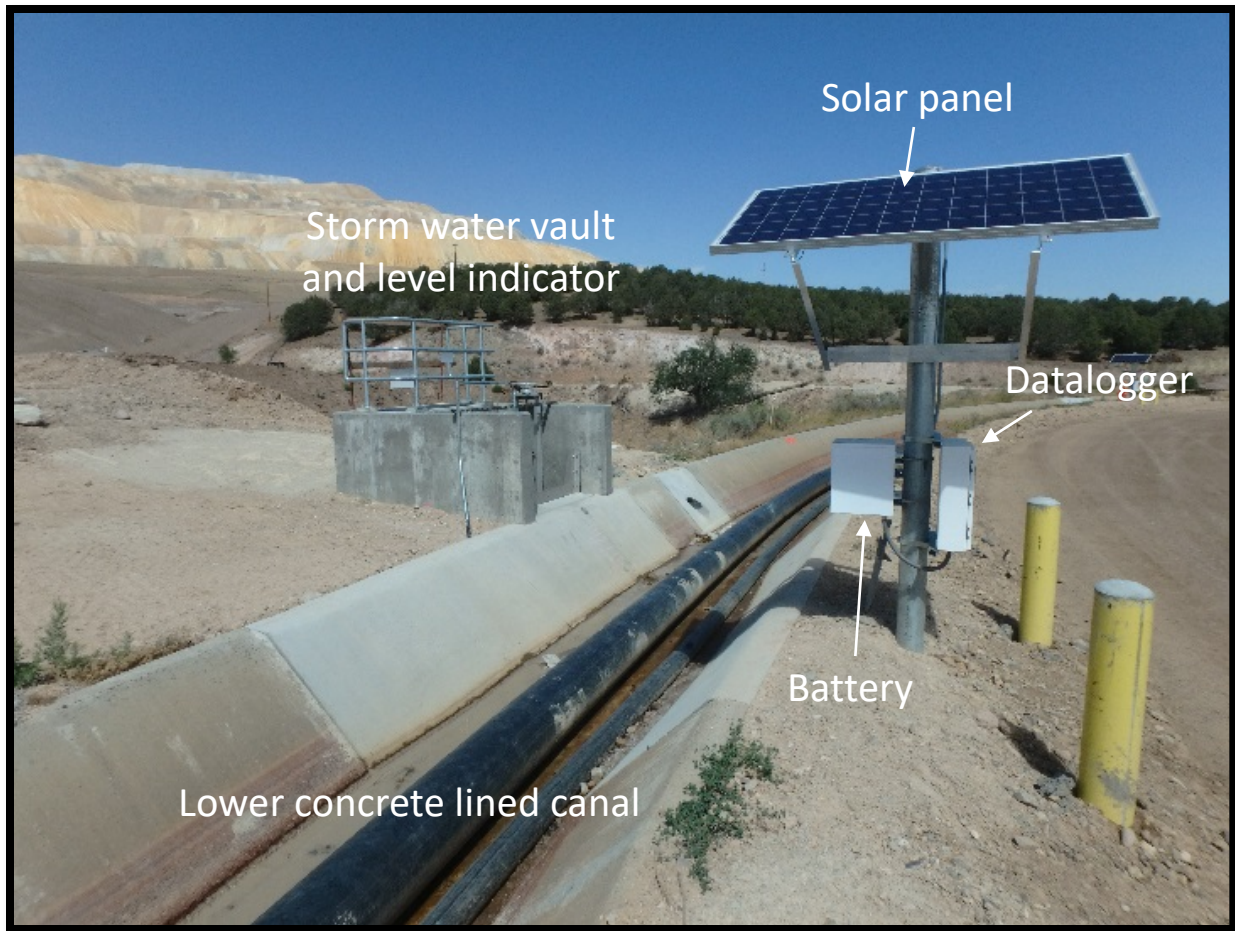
Photograph of a newly constructed storm water vault, level indicator and lower concrete lined canal.
